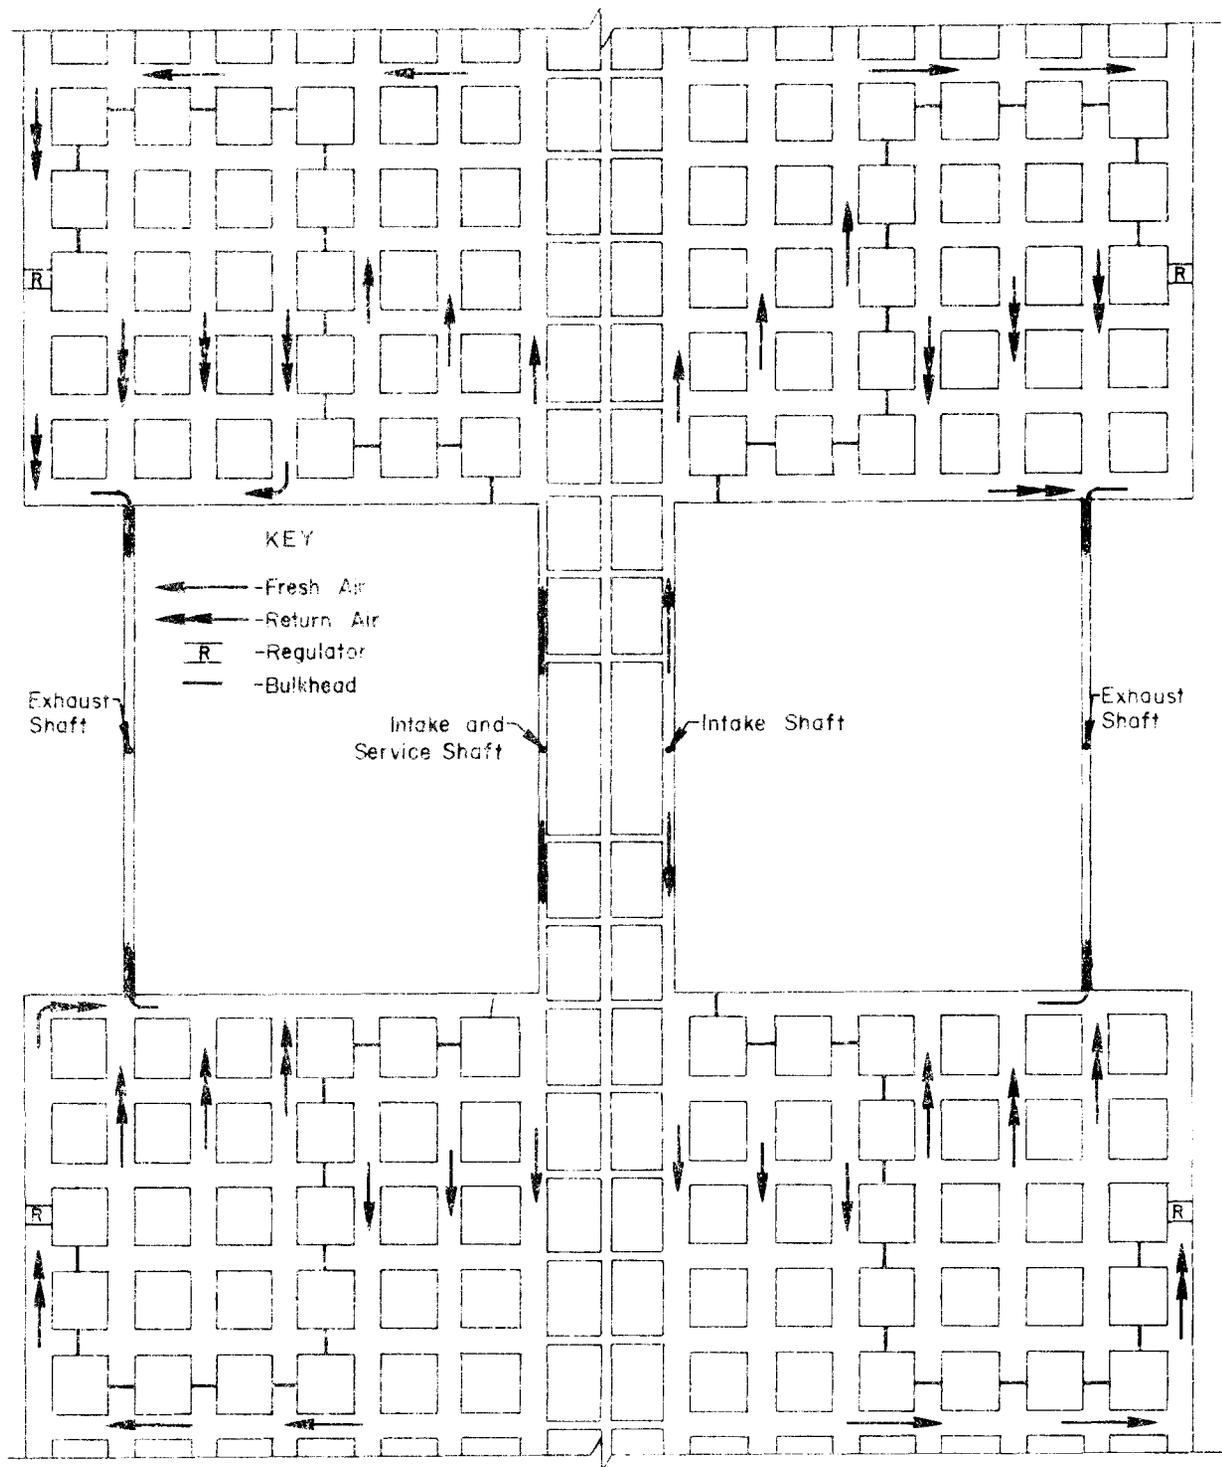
Plan View of Ventilation Network, Advance Entry and Pillar Mining
